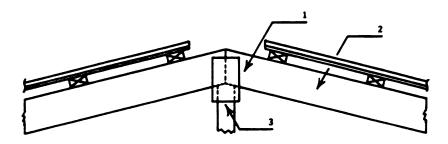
Location of test sites, Barn E. Truss No. 1, 8.5m (28') from north end. North elevation. Flashing, bird netting not shown.
